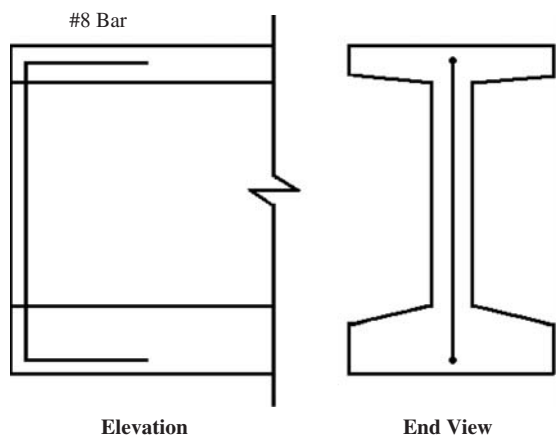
End zone detail used by Central Pre-Mix Prestress Co., Spokane, Washington.
